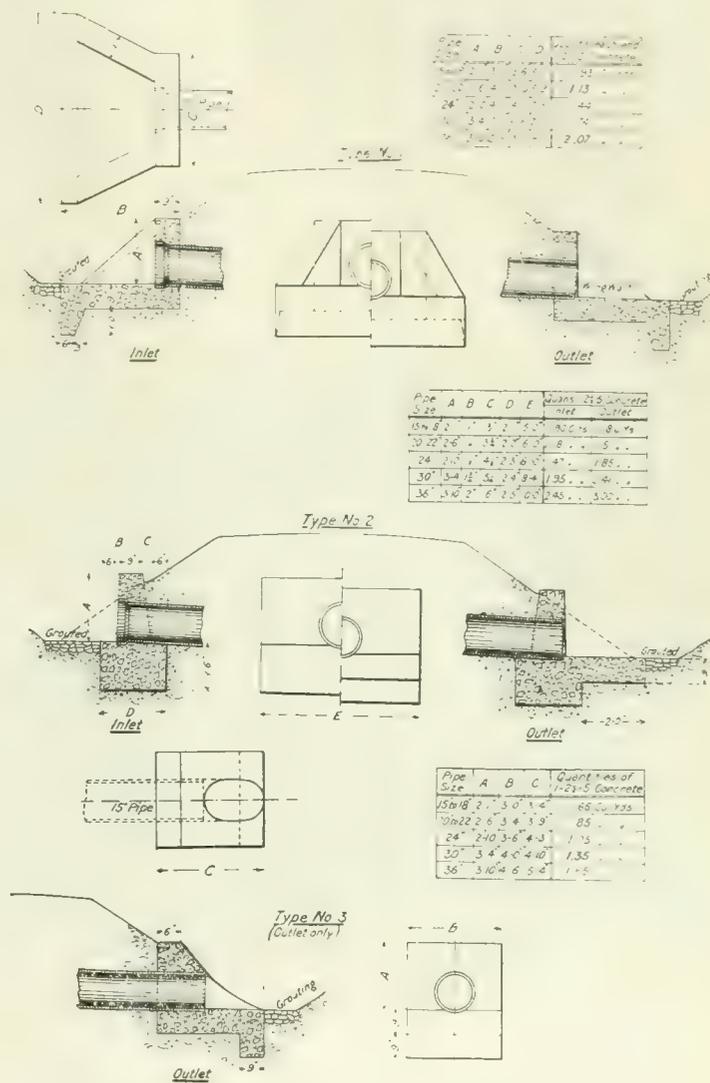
(b) Details and Quantities for Pipe Culvert End Walls.
